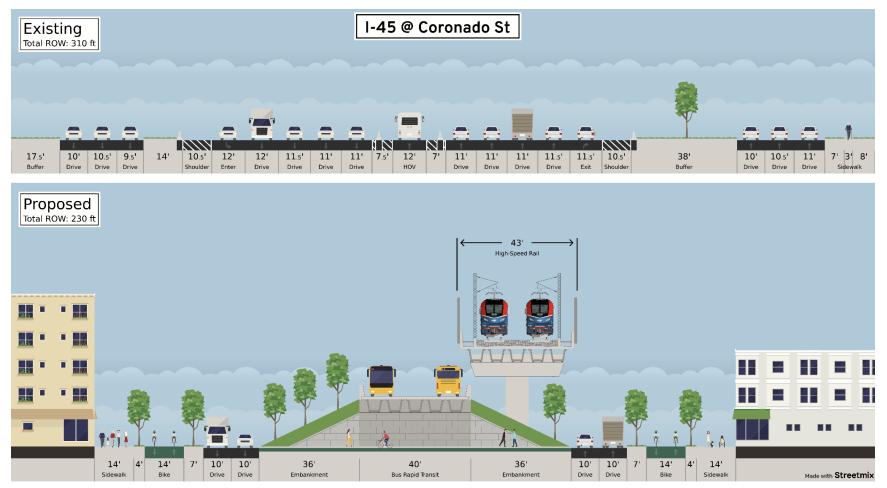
I-45 at Coronado St, between the Heights and Near Northside. Above: the existing 17-lane highway has a narrow sidewalk on one side. Below: our proposed boulevard has sidewalks, bike lanes, four general-purpose lanes, elevated buses, elevated rail, and spare land used for parks and homes above businesses.
